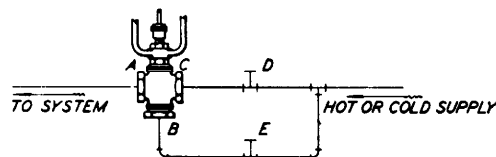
Showing how connections would be made where it is desired to shift from heating service to cooling service by manually opening and closing proper valves in the supply line.
